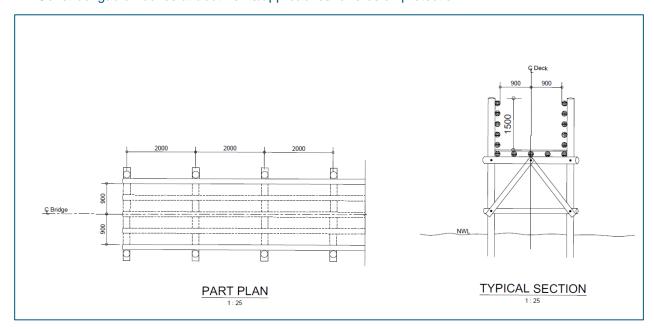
Proposed Design of the Wooden Boardwalk Structure over Lake kuZilonde
